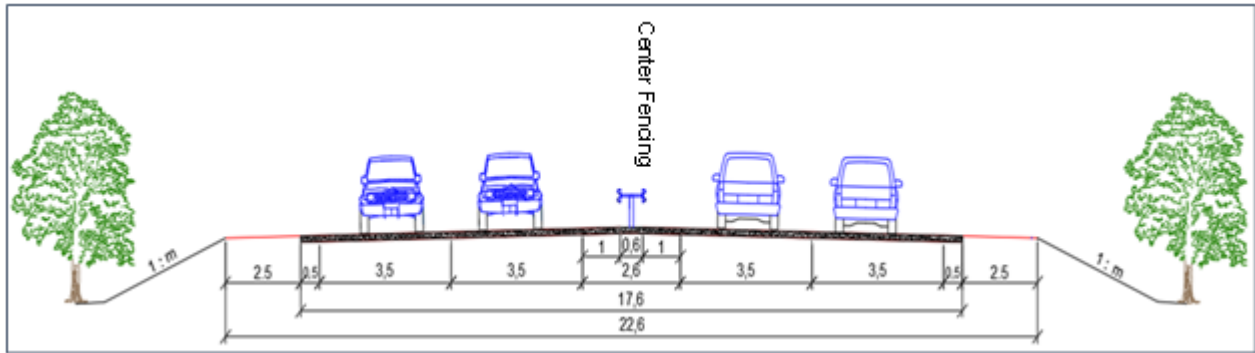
Typical cross-section of the road in locations outside of residential and built up areas.
